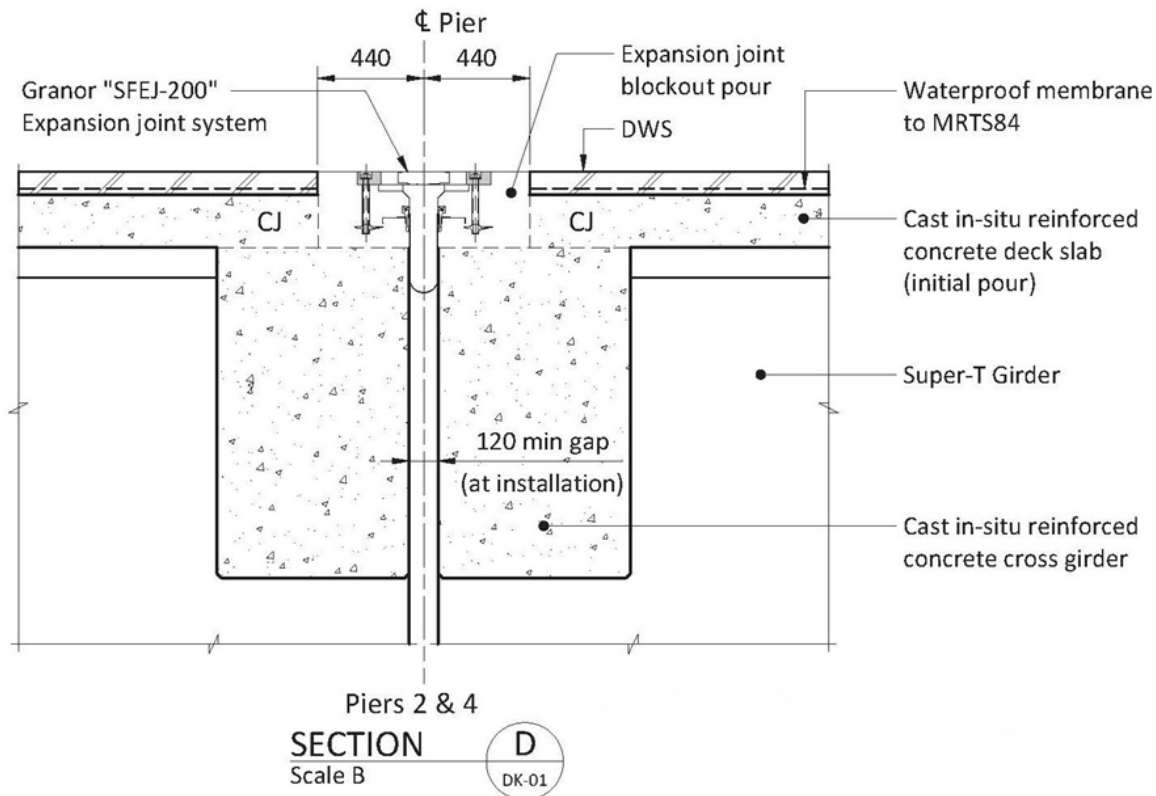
(c) – Example cross-girder design at continuous joint at pier
